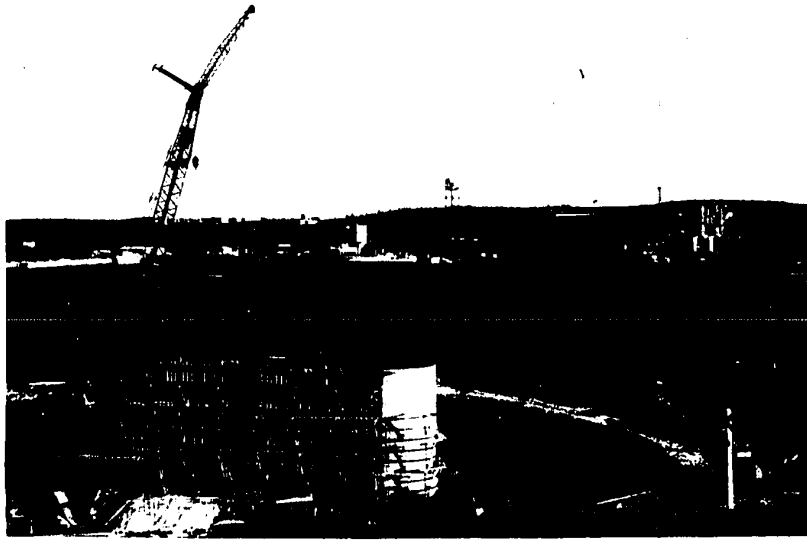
HALIFAX MAIN TOWER PIER UNDER CONSTRUCTION IN DRY CONDITION
